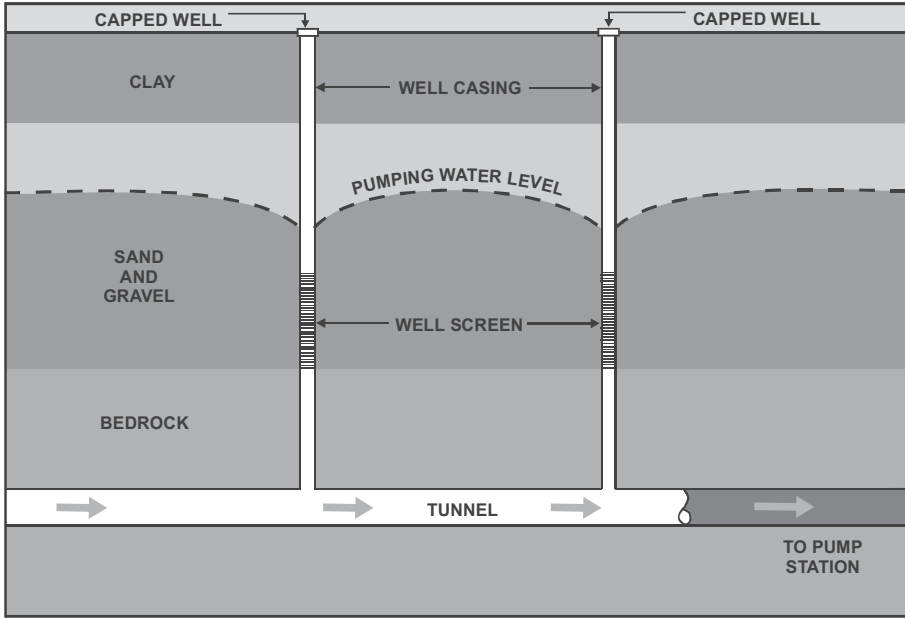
Vertical Wells Connected by Hard Rock Tunnel (Looking Toward the River)
